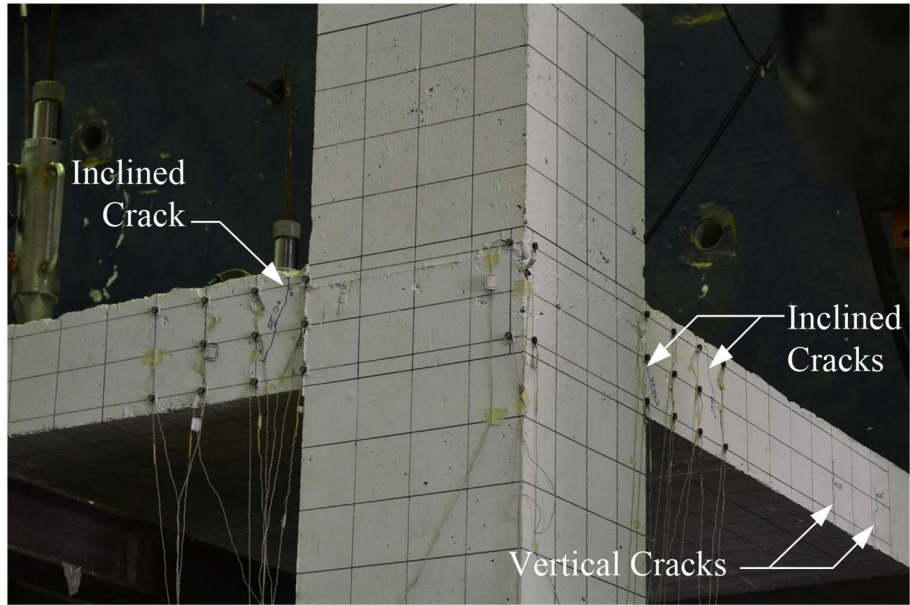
Crack Pattern on the North and West Slab Faces of Specimen R1 at 0.25% Drift
